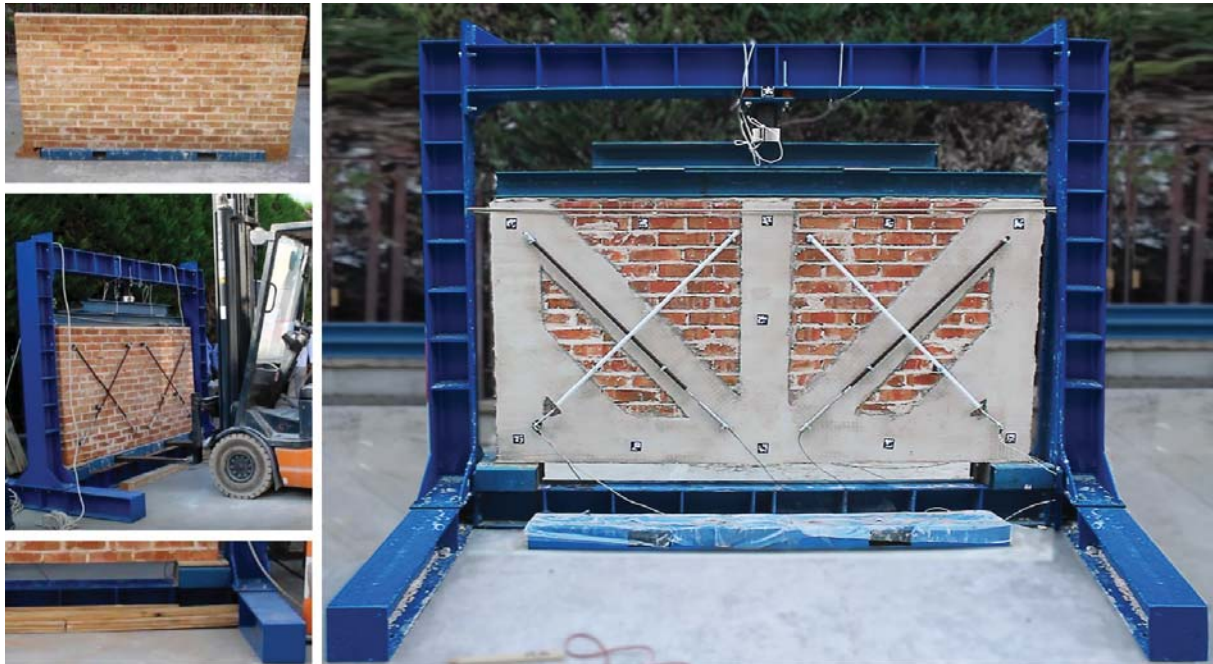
On the right starting with the top row, the ordinary wall ready to be moved, handling of the same and the subsequent removal of the steel support, zoom on one of the two remaining supports. On the left, masonry wall reinforced with truss-like application of FRCM at the start of the test, all components of the setup.
